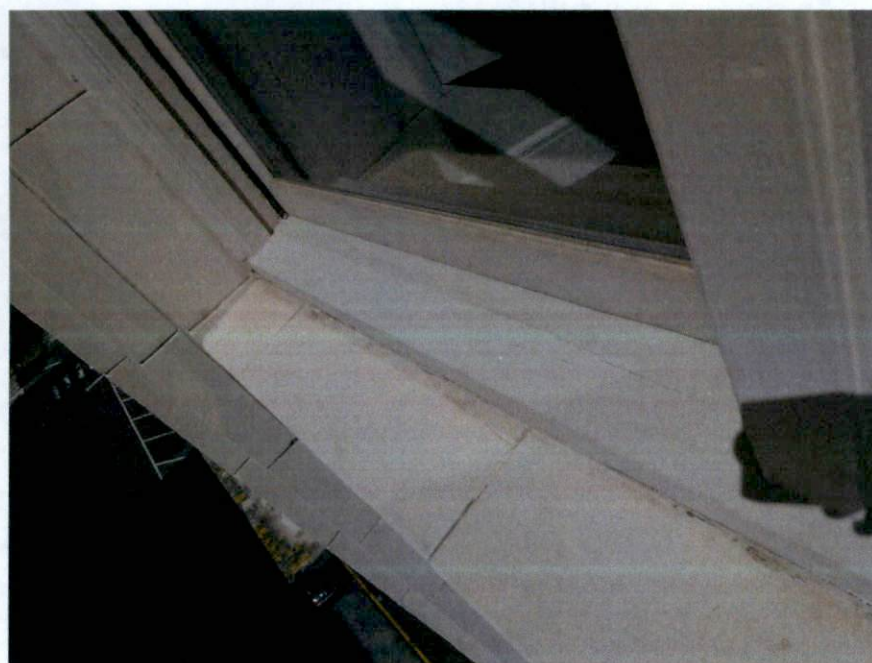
Photo F: Detail view of typical wood windowsill condition along Market Street façade. Looking south.
